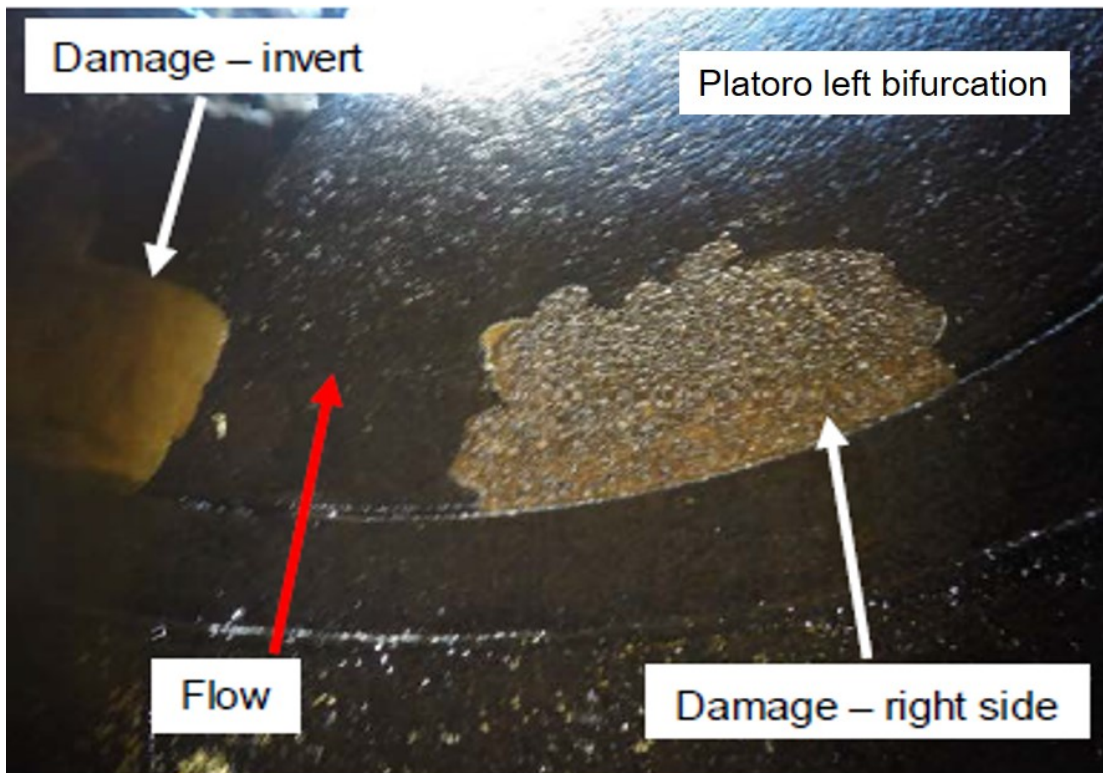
Polyurethane lining delamination at a pipe joint in the left bifurcation of the outlet works at Platoro Dam, 2019. Looking downstream.
